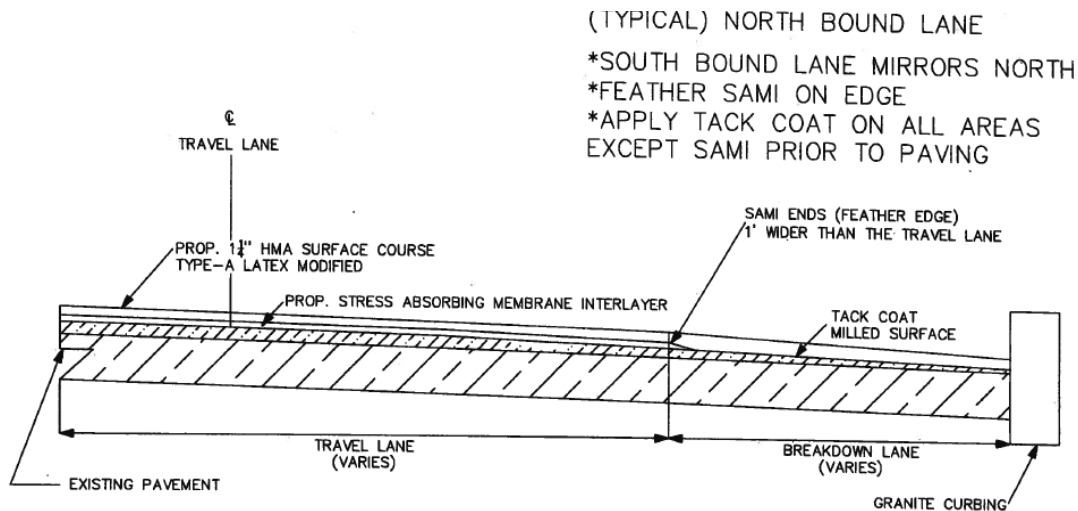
P1 typical section detail, Route 8 Lanesboro-Pittsfield
